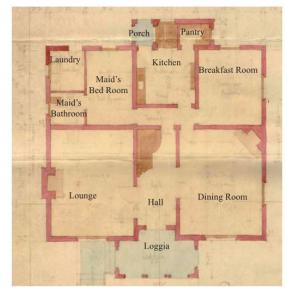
Original Ground Floor level, 1929 Source: Woollahra Council
